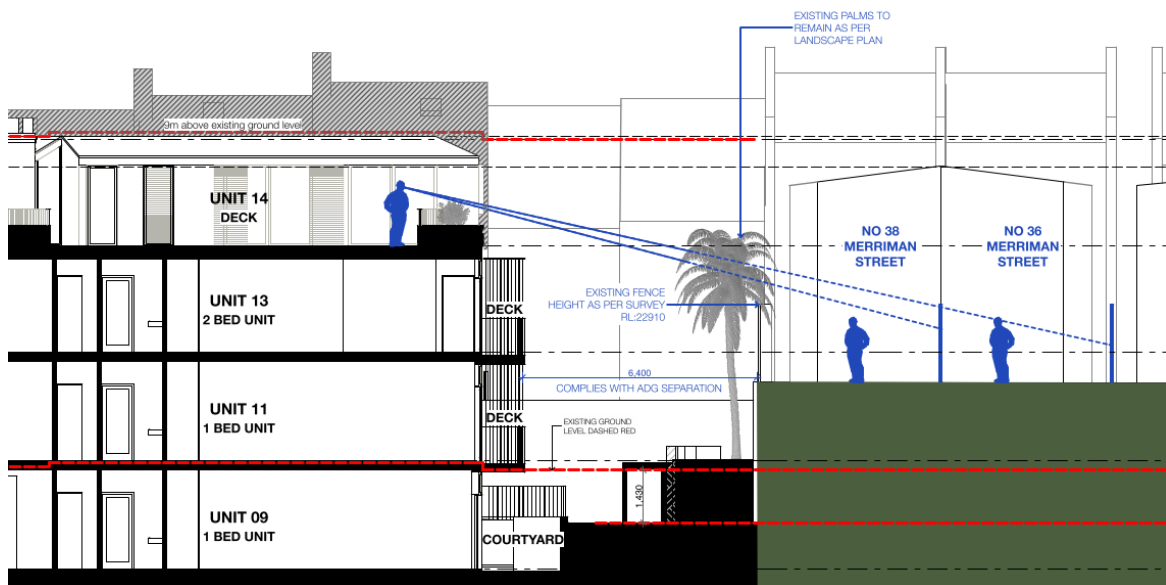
Proposed sightline from private open space on upper level towards properties to the north
